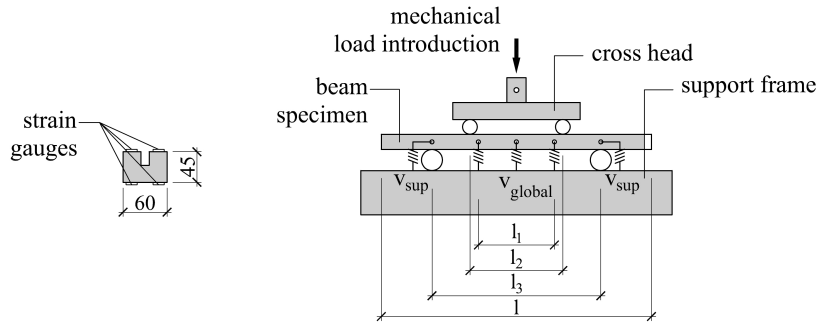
Cross-section and scheme of test set-up used for four-point bending test on timber type B.
